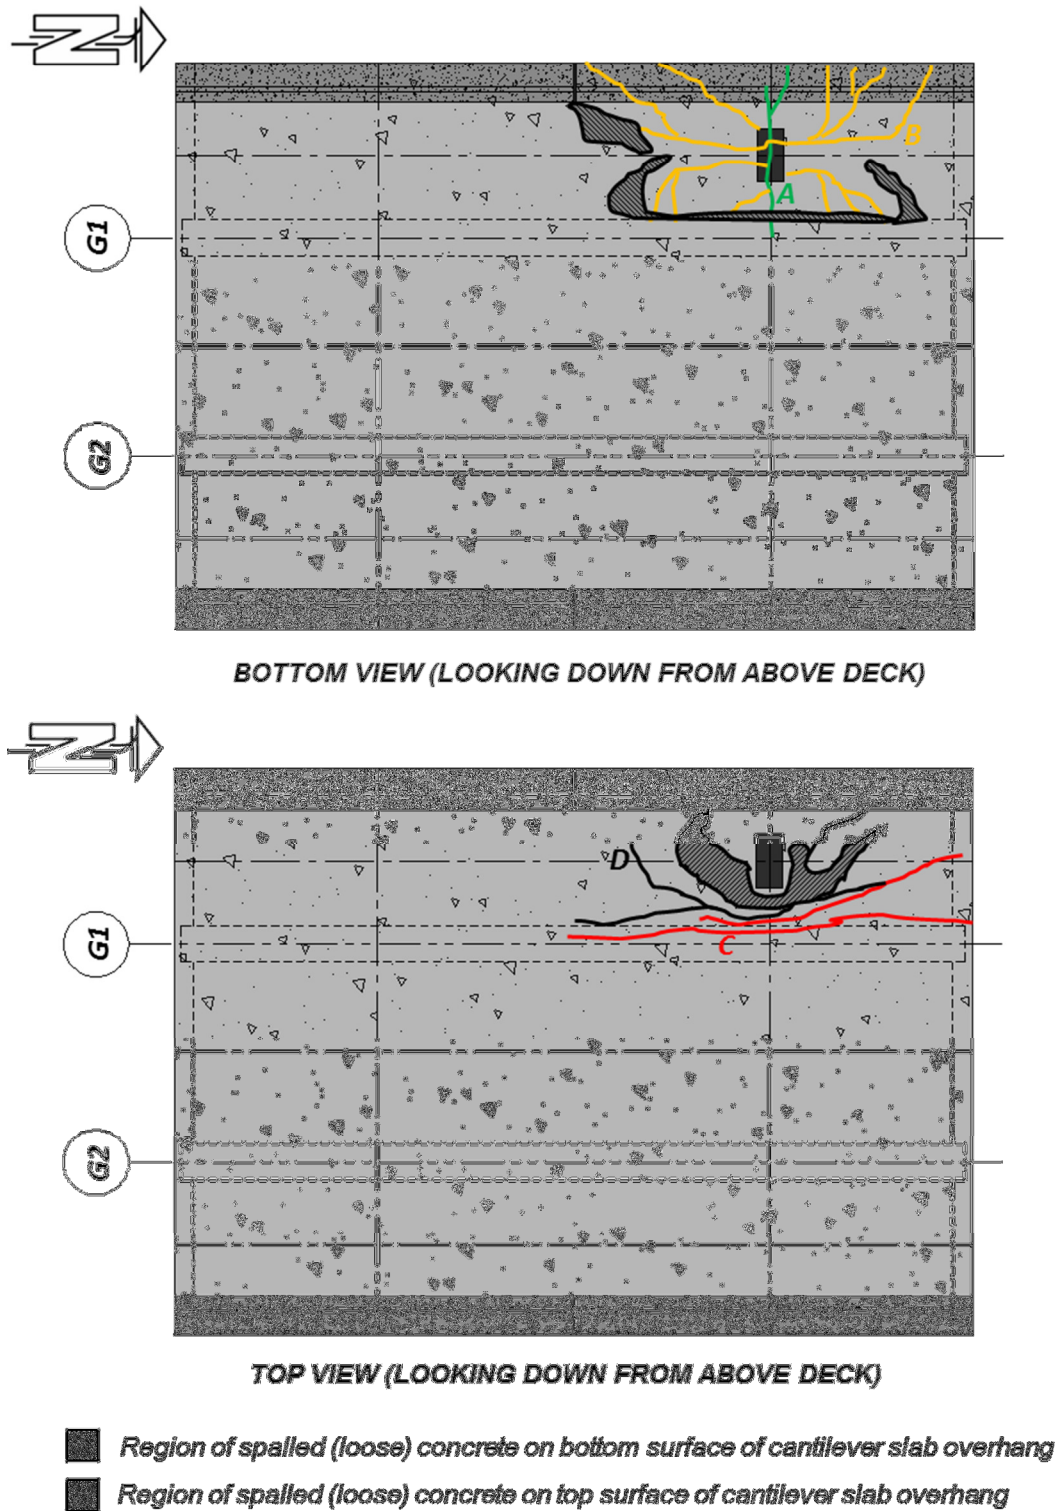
Crack patterns for the cantilever section with GFRP reinforcement subjected to static monotonic loading
